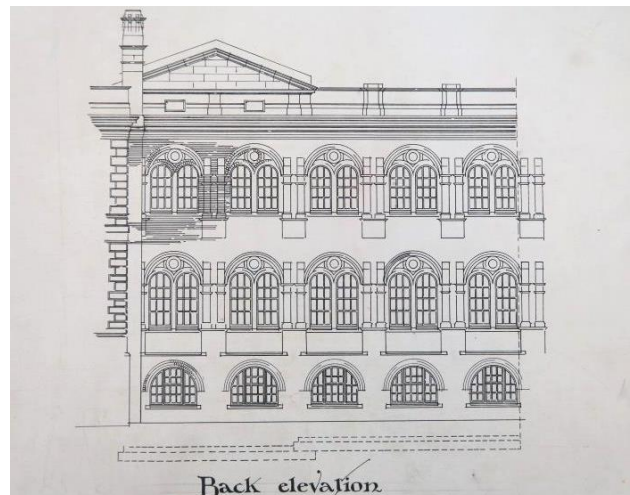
Back (western) elevation of Link Building (generally as constructed)
